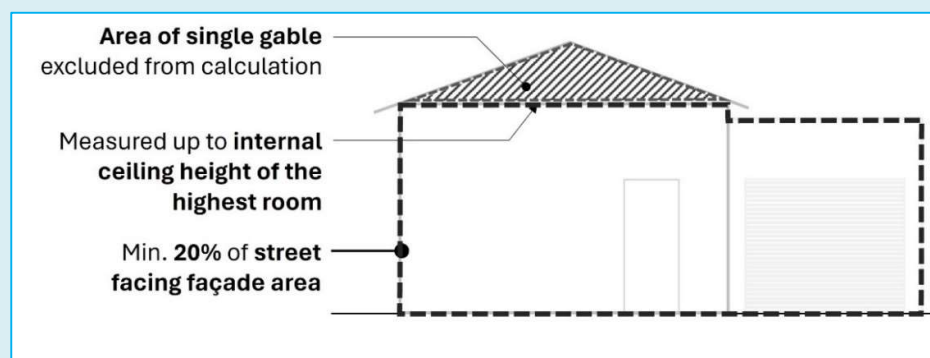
a: Street facing façade area – Single Storey Unit
